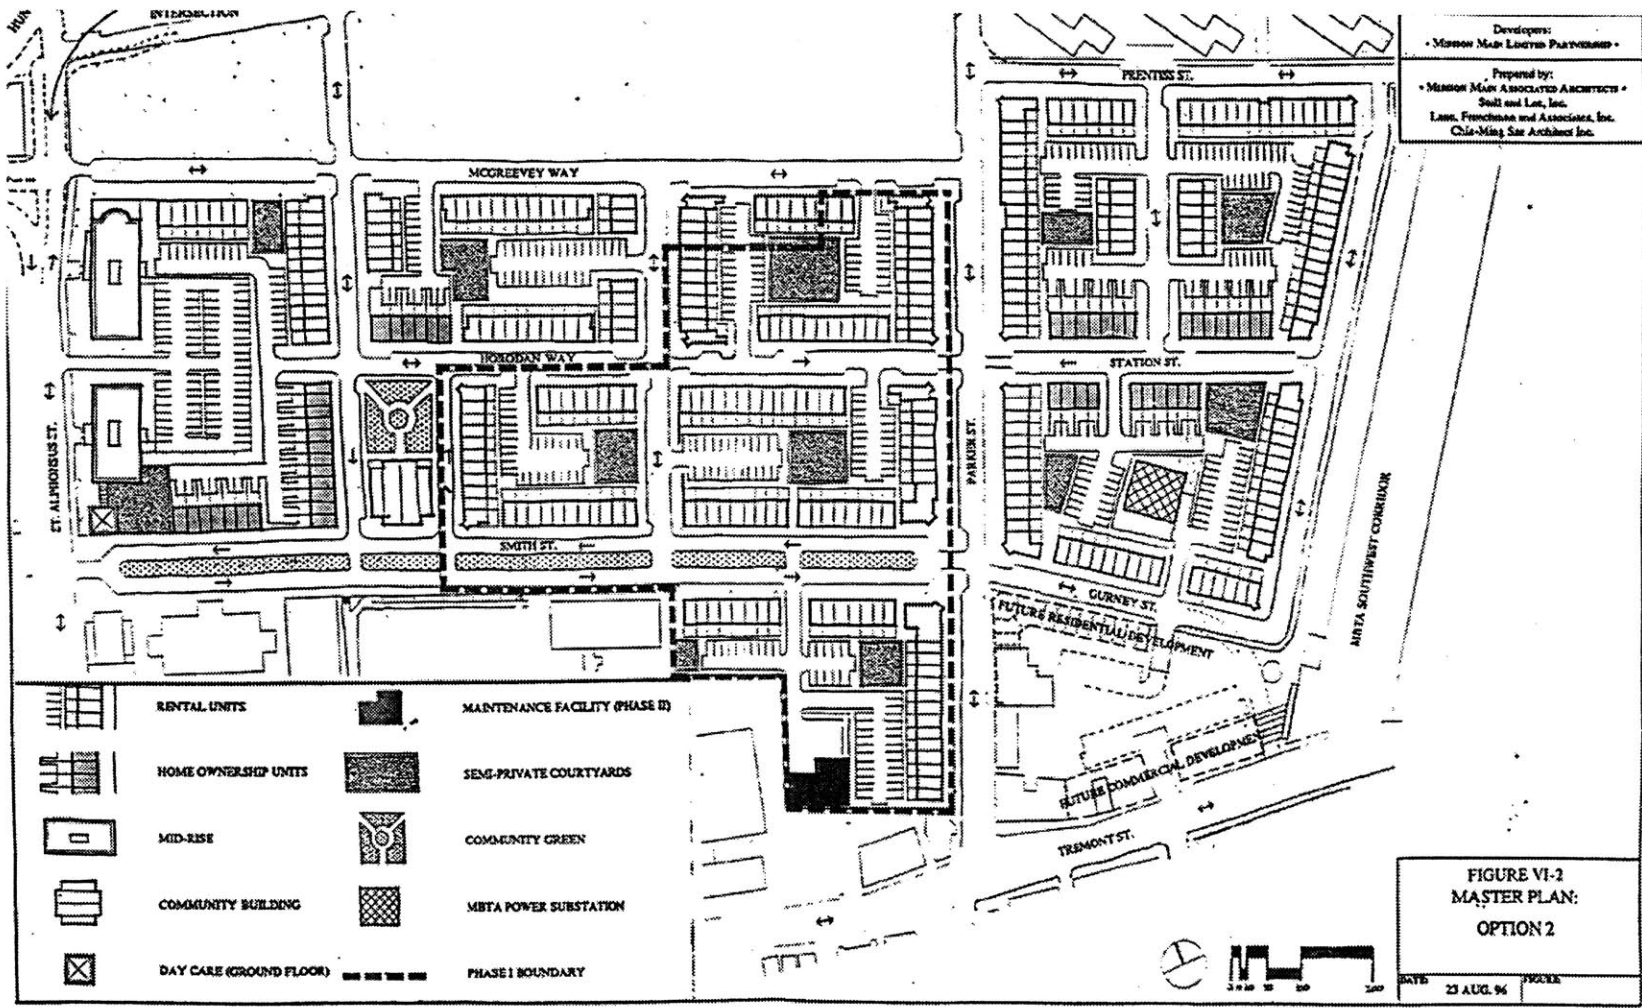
Boston Housing Authority Proposed Plan for Mission Hill / Roxbury Crossing Site. Plan includes Wentworth Institute land swap. Existing buildings on site to be razed, with exception of MBTA power substation.
